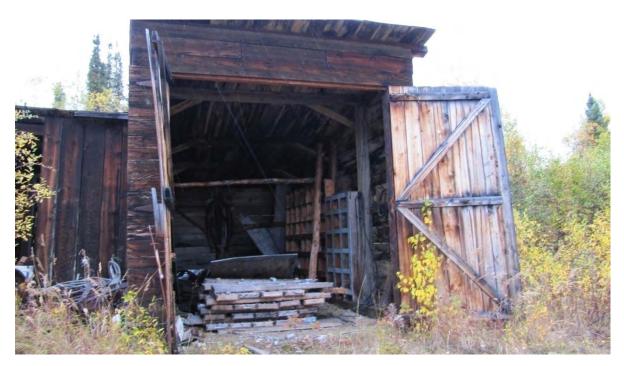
Site 1, view east showing interior view of the larger of two plank shacks [4]
